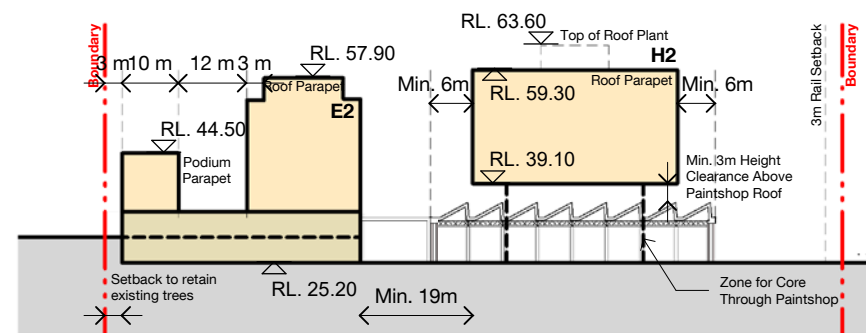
Building envelopes section diagram through E2 & H2
